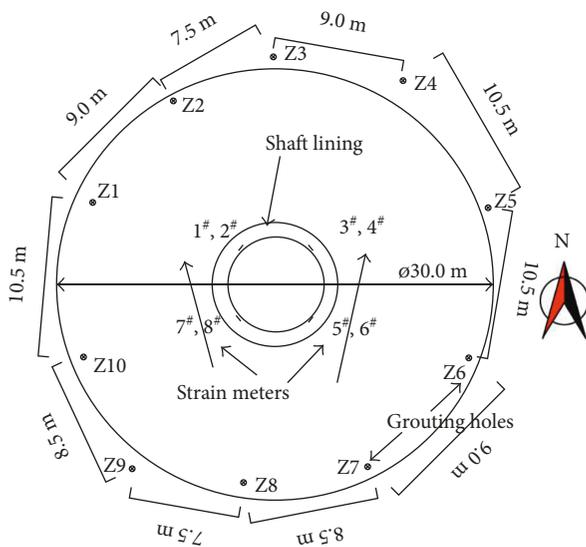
Sites of grouting holes and layout of concrete strain meters [27].
